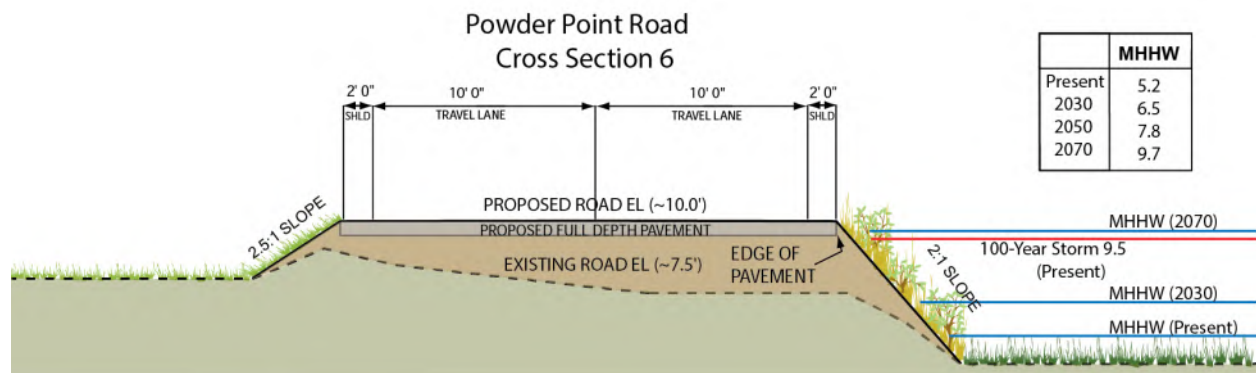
Powder Point Road adaptation plan at Cross Section 6
